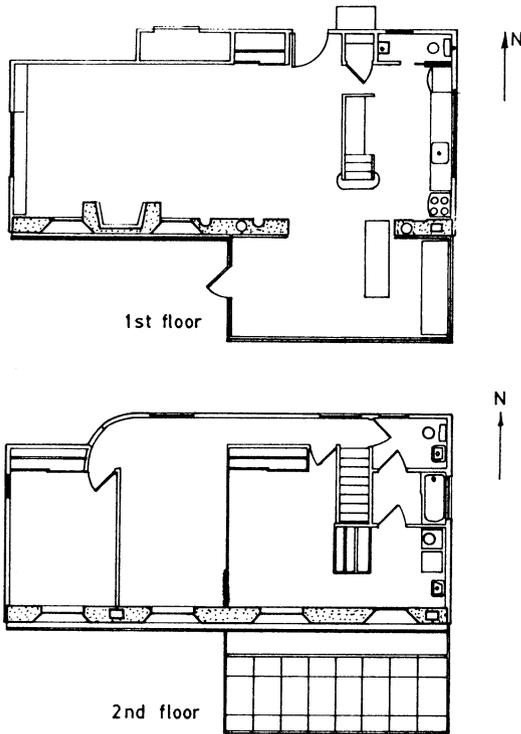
FLOOR-PLANS OF KELBOUGH HOUSE (From SANDIA[29])
